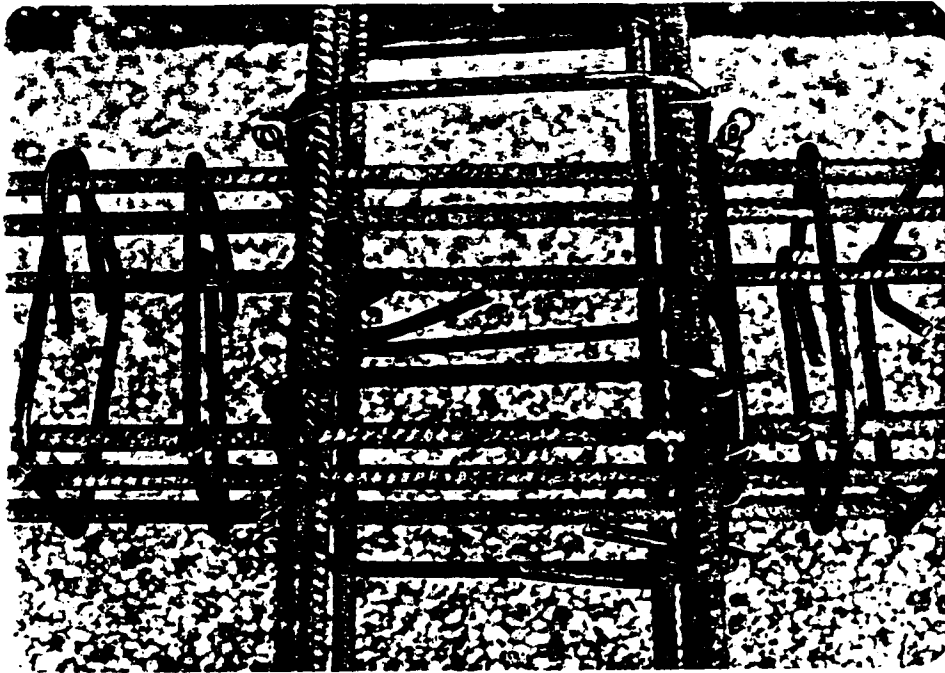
JOINT REINFORCEMENT, SPECIMEN 3
